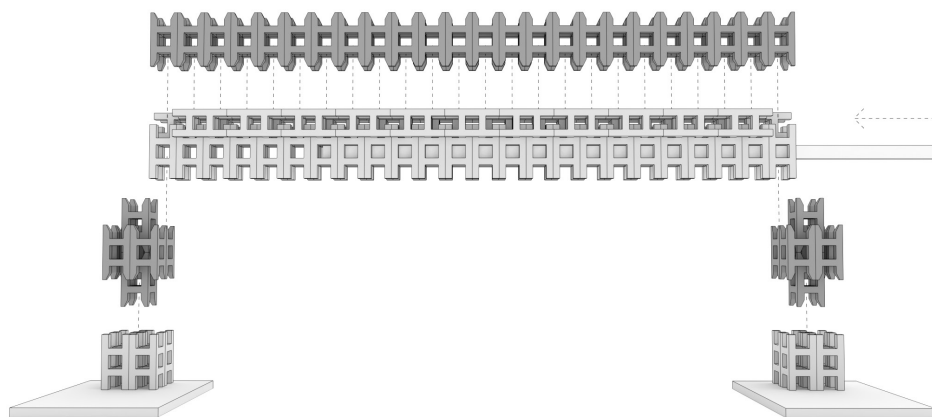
Diagram of beam assembly. In darker gray, parts were assembled by the UR5e, and in brighter gray, parts were assembled by people. Authors, 2023.
